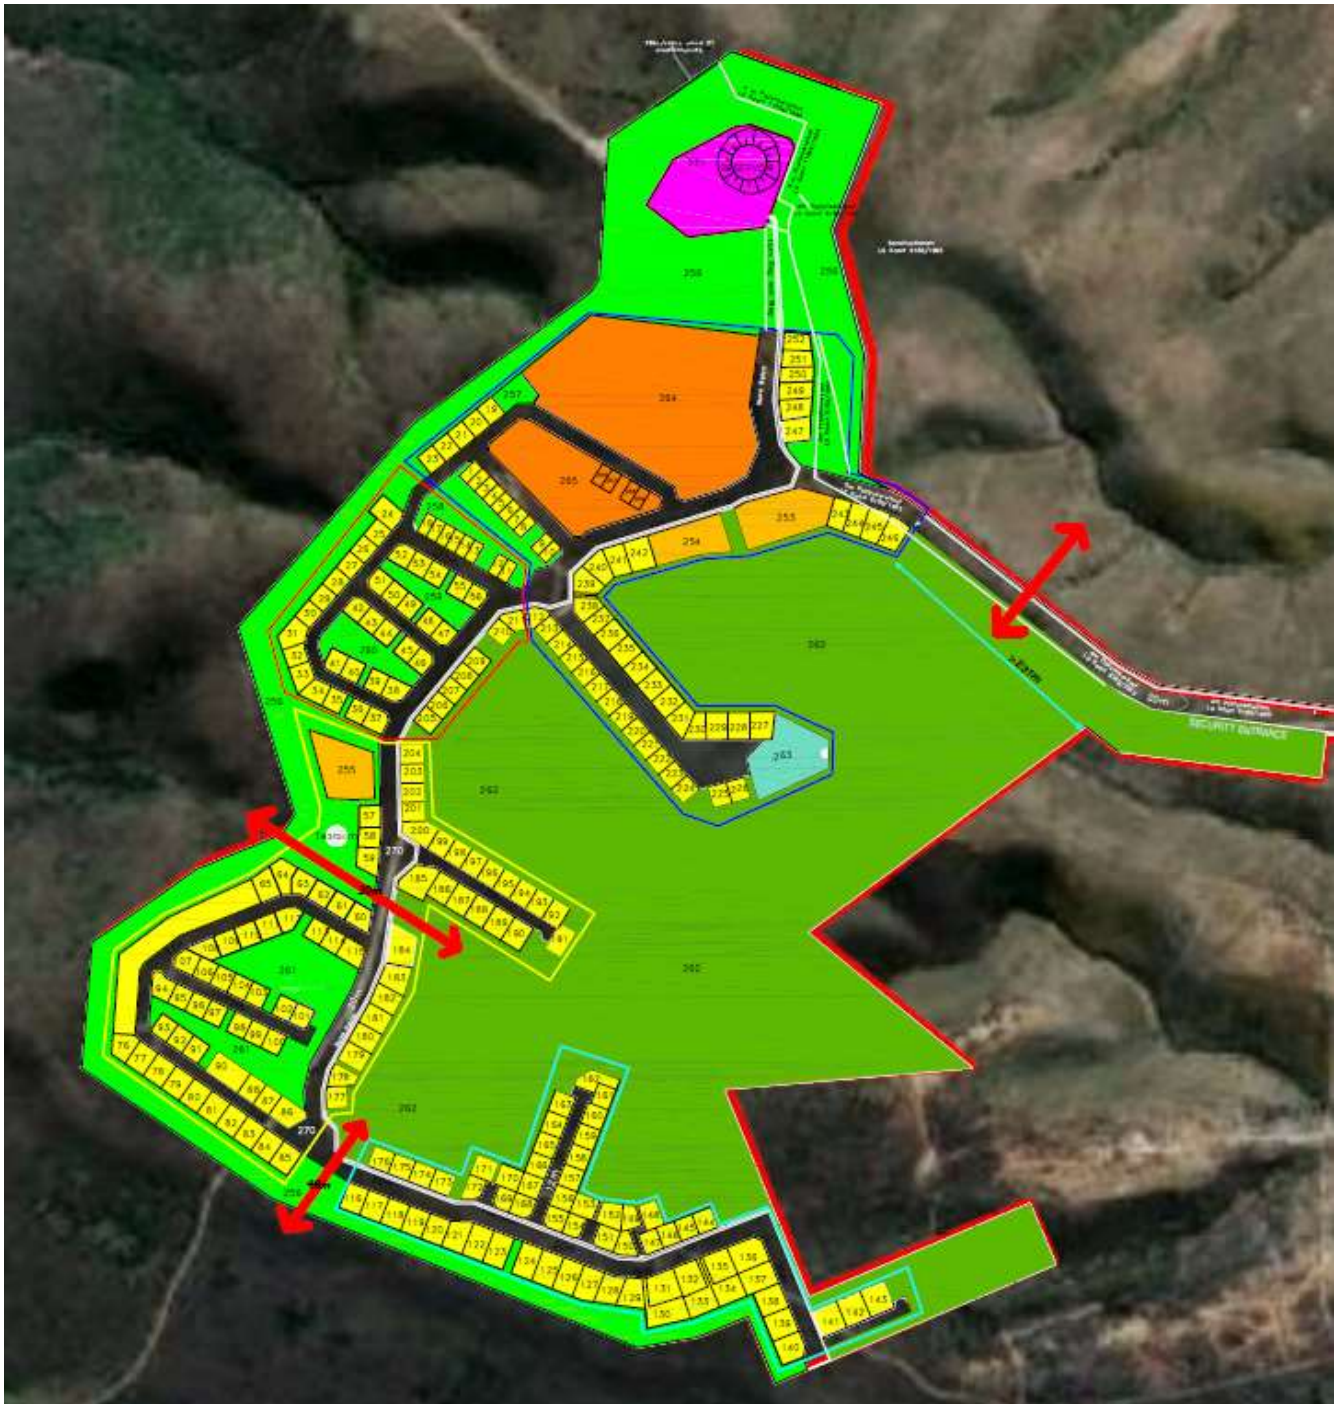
Preferred Site Layout Plan (as mitigated)
